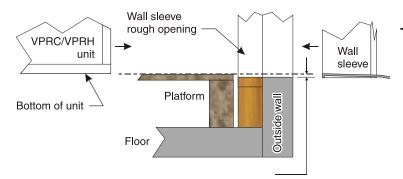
Typical VPRC/VPRH Installation, With Platform
